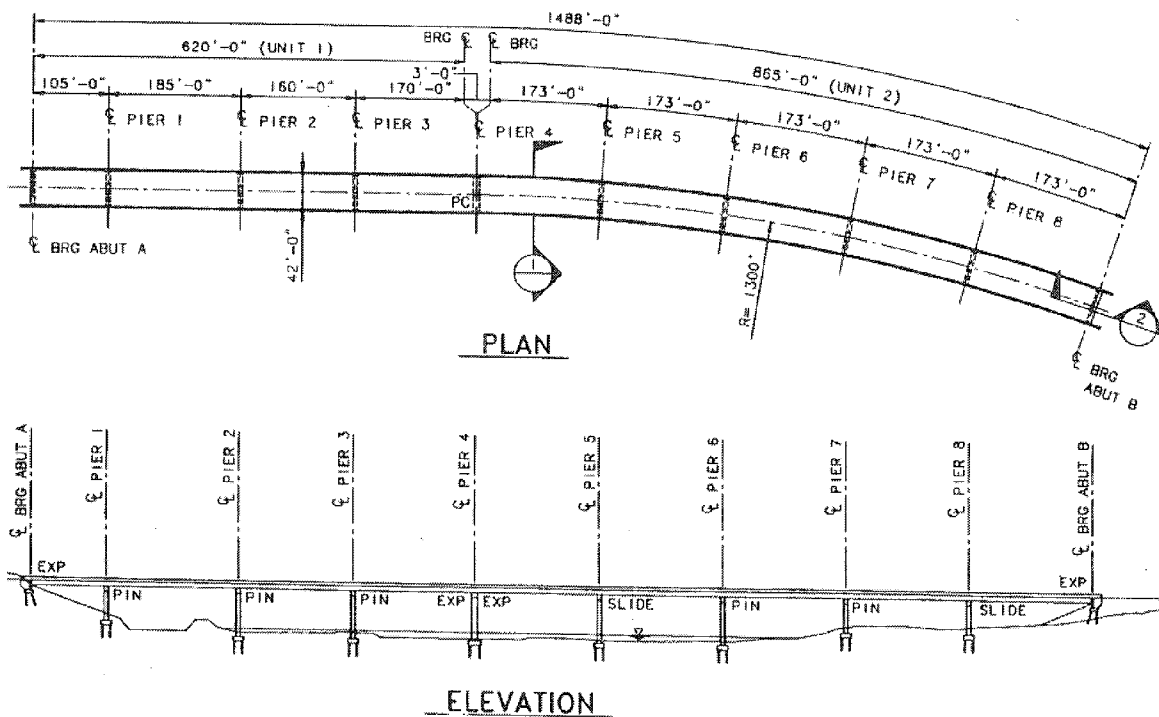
Plan and elevation of the nine-span viaduct steel-girder bridge
